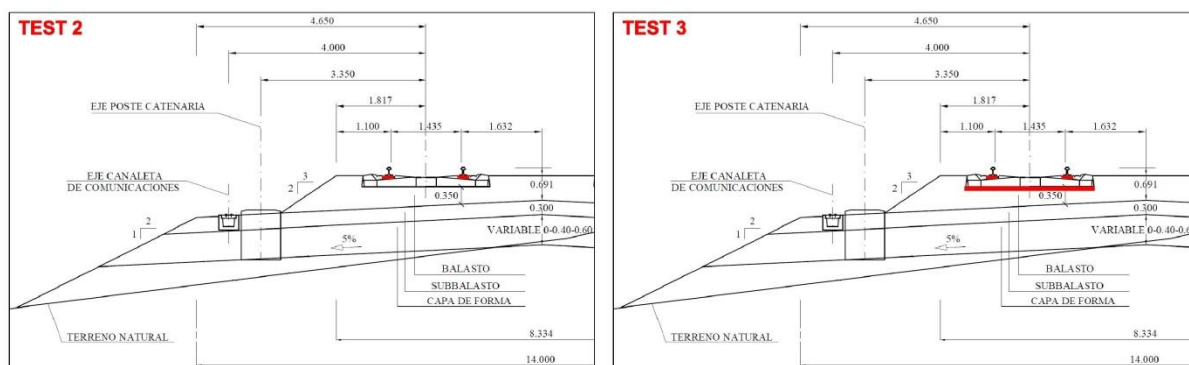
IMPROVEMENTS IN THE TRACK SECTION TO HOLD VHST
